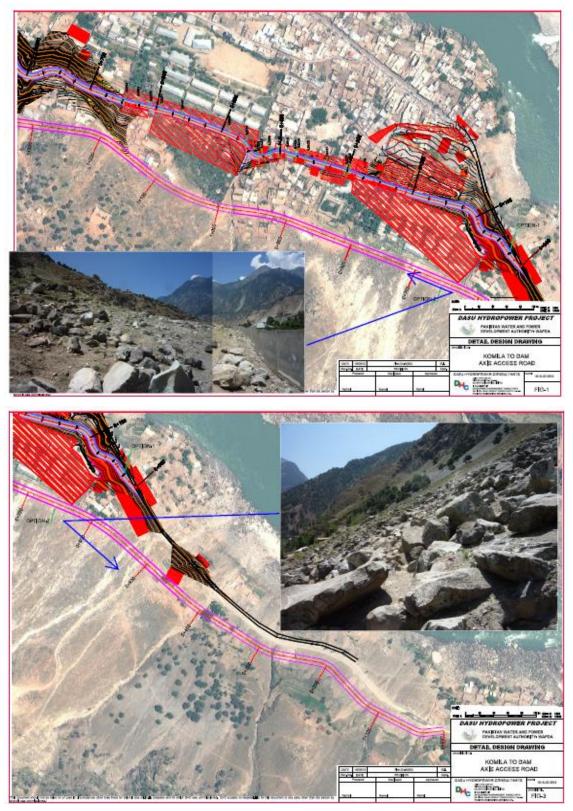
Alternatives for Dam Site Location in Detailed Design
